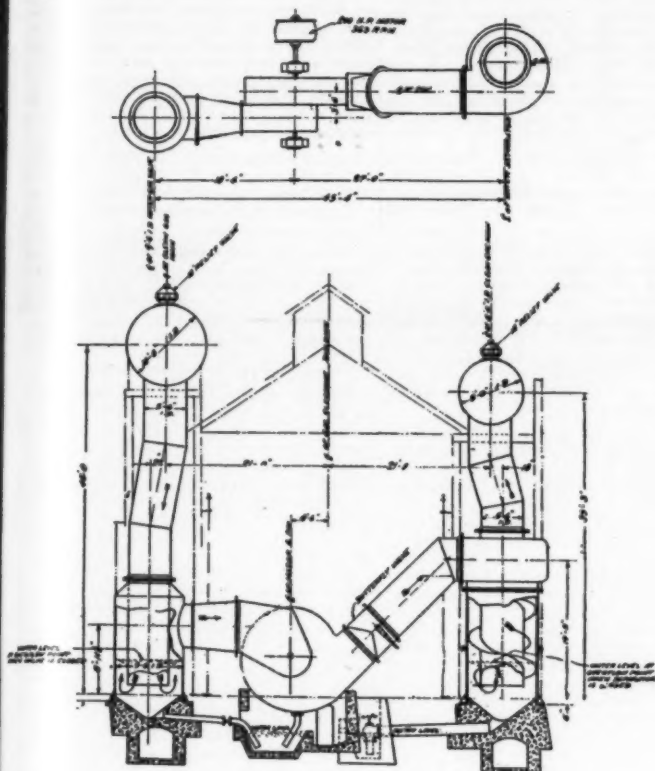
Section through fans, and method of passing gas through seals and separators.
